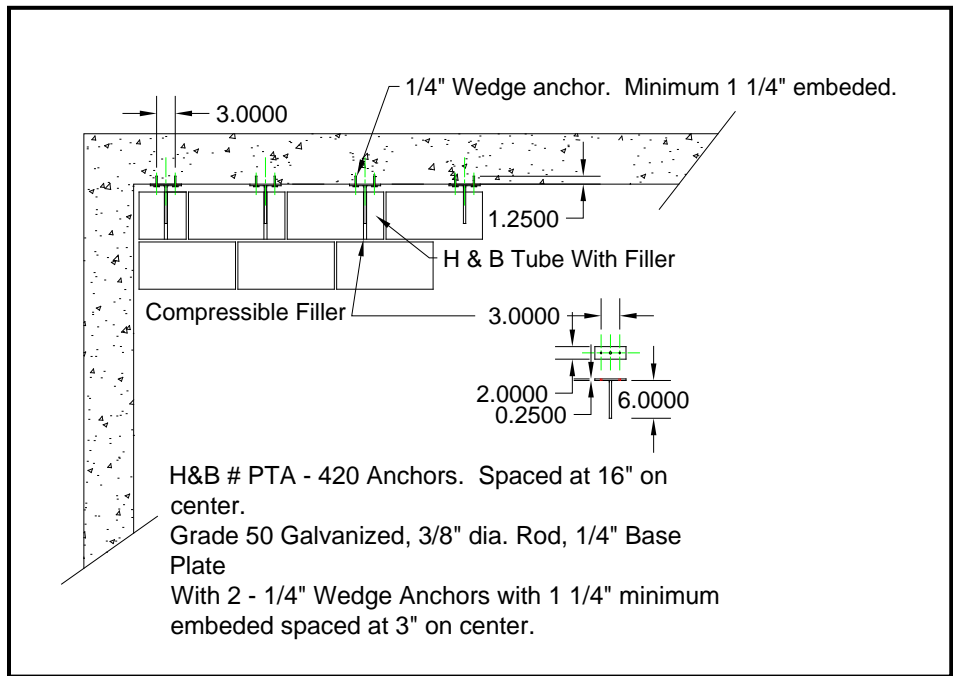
Dowel details for CMU wall construction in all the full-scale reaction structures.
